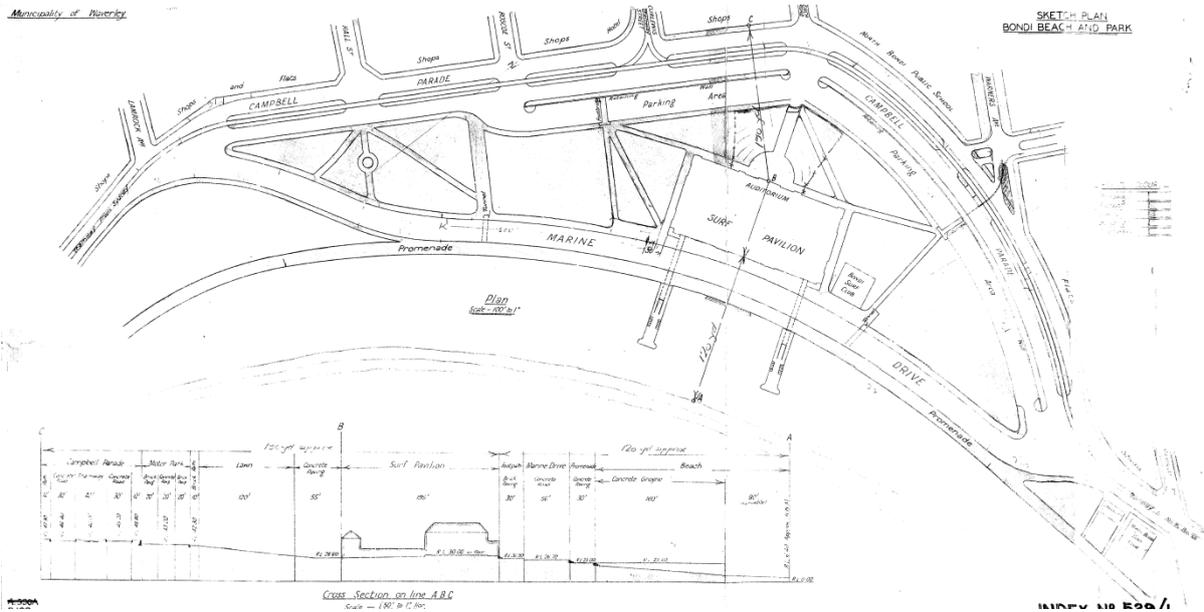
Undated plan showing the path layout and an overall section. Source: Held by the Engineering Department of Waverley Council. Plan 529
